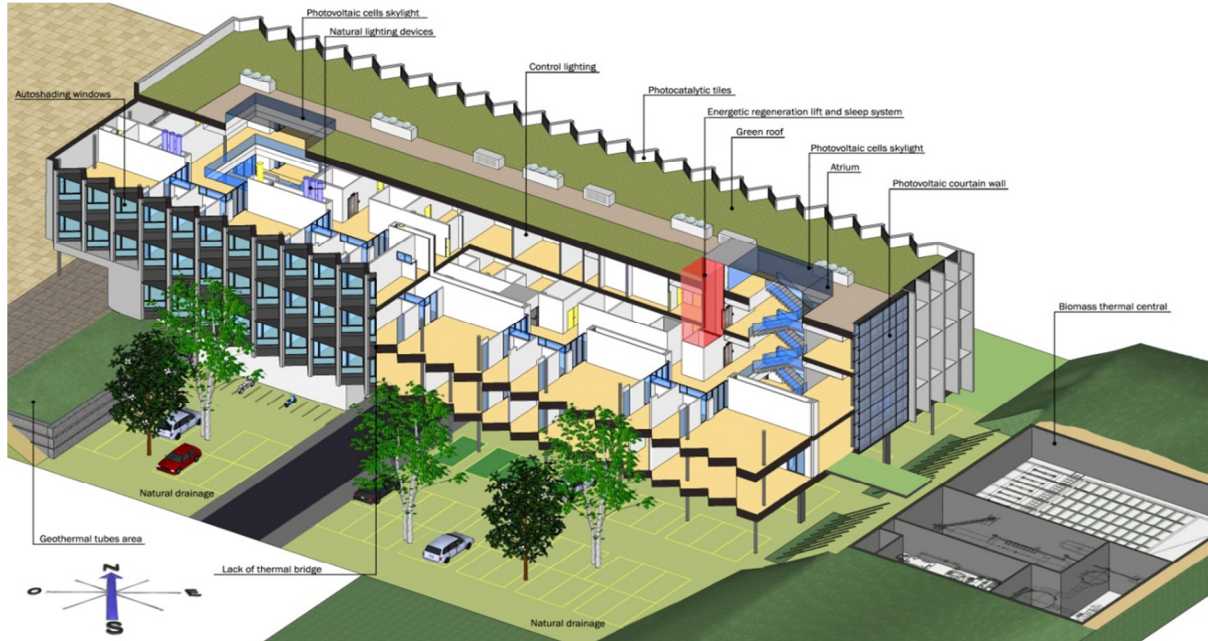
Axonometric section: Green roof, Tubular day-lighting devices, open car park, and biomass place
